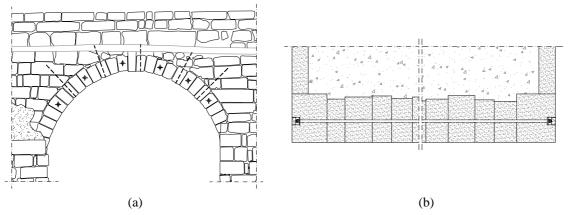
Strengthening of the central arch: (a) adopted anchor scheme; (b) full bridge width anchors.
